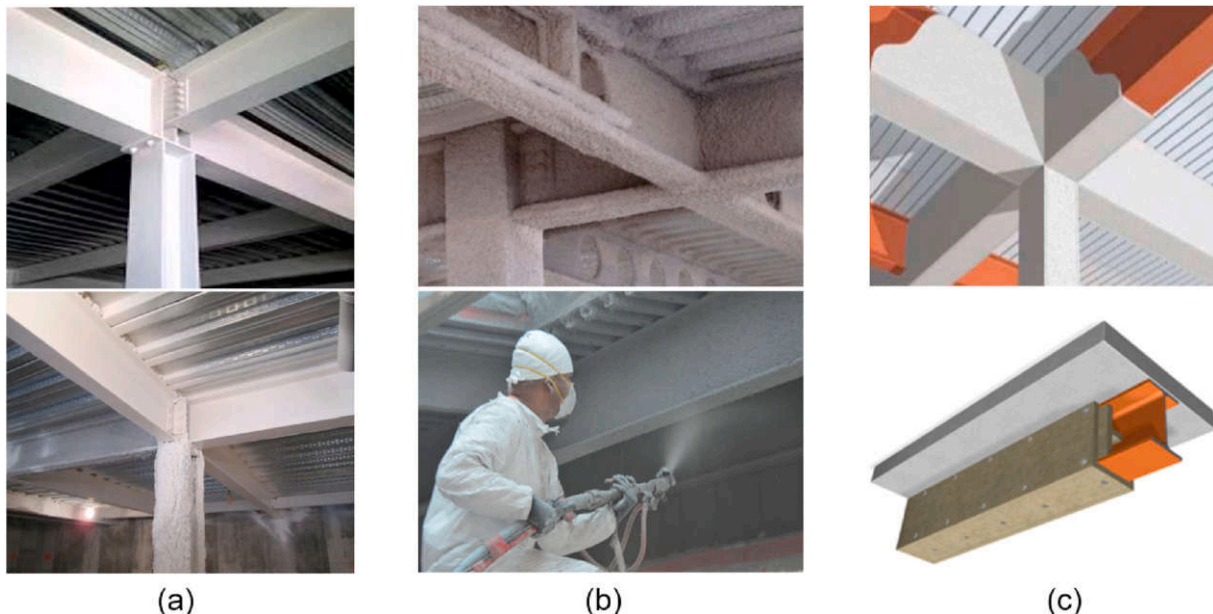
Existing fire protection systems: a) Intumescent paints; b) Sprays; c) Boards.
